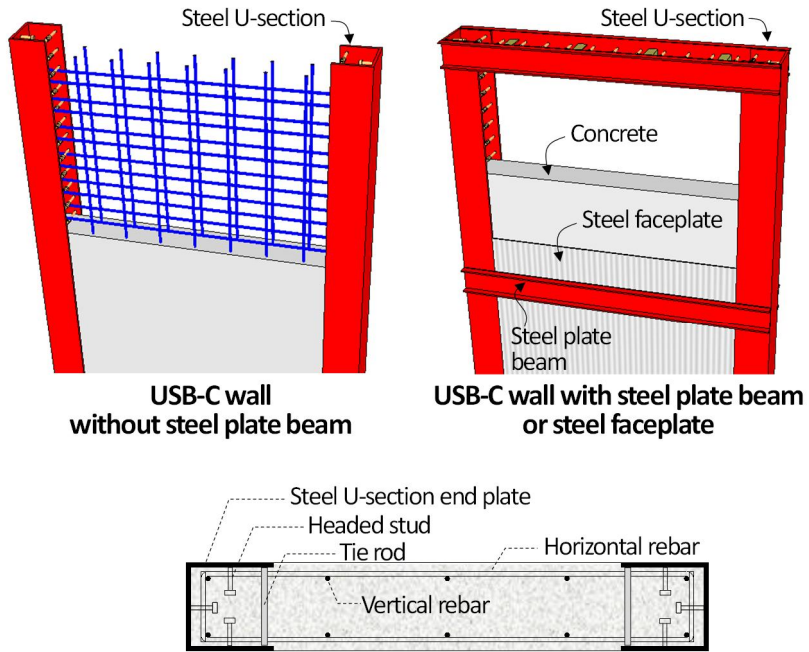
Steel U-section boundary element-Composite (SUB-C) Walls.
